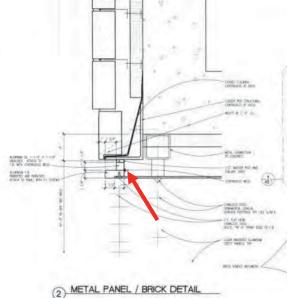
Depicts through-veneer flashing at brick archway to .125 aluminum cladding system as depicted in Project Record Detail A-8.1/5.
